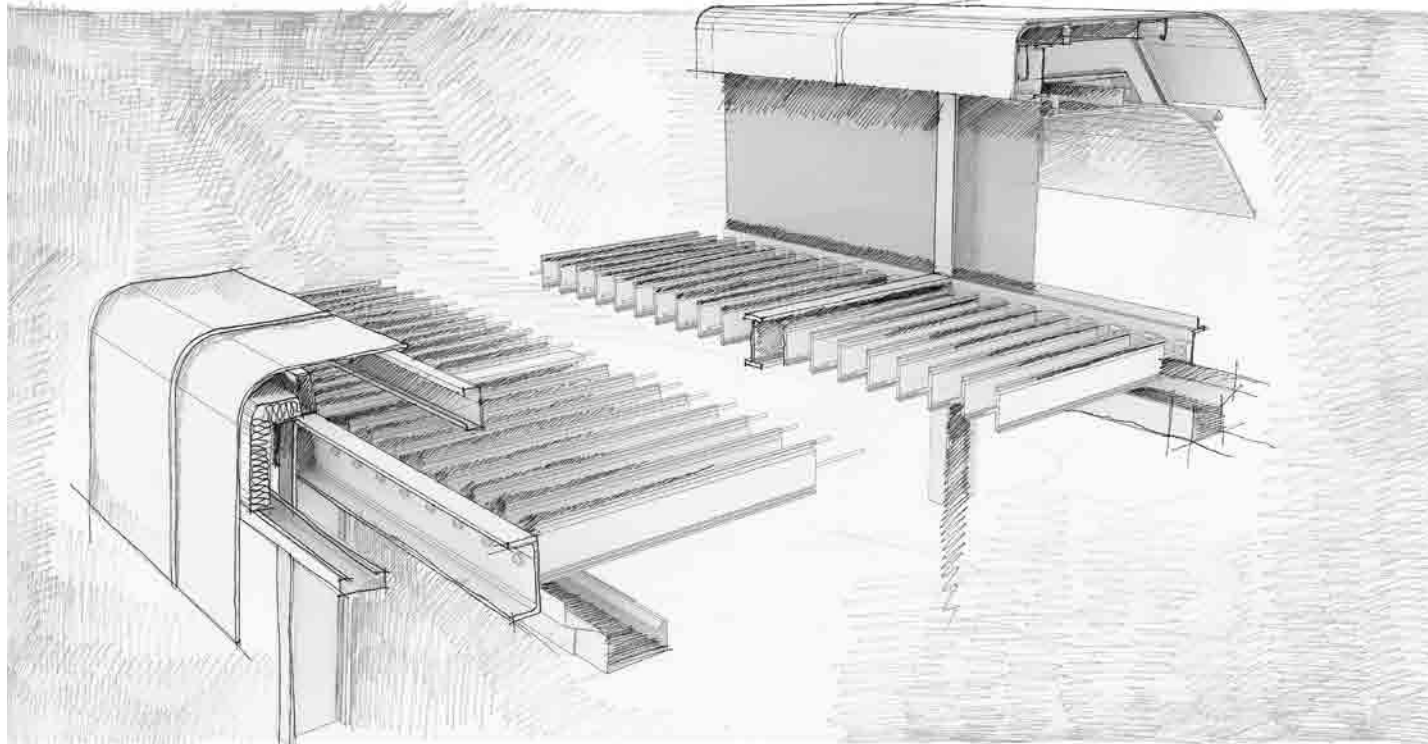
PERIMETER LIGHTING DETAIL SCALE: 1:5
